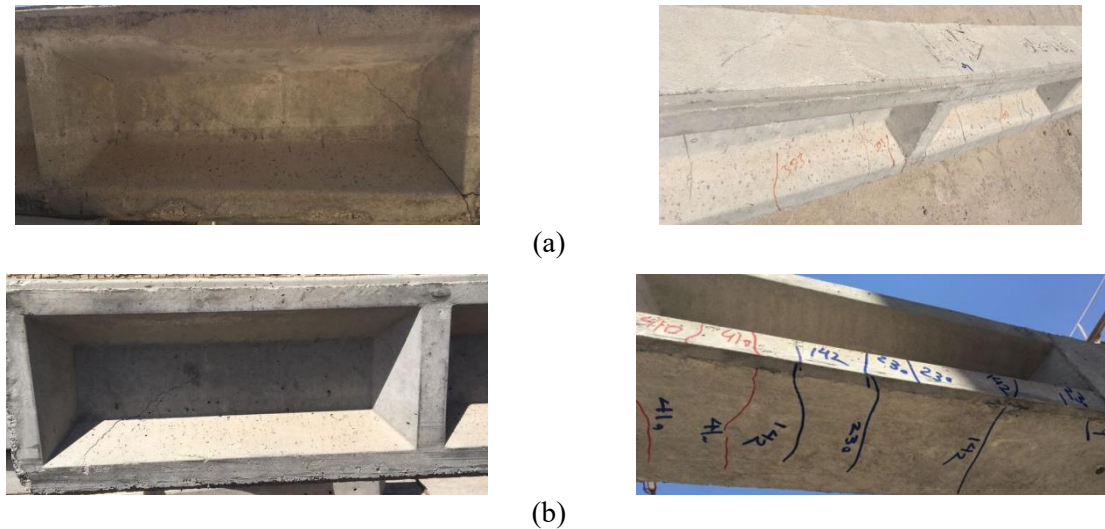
Cracking in: a) 9-400-60-1, and b) 9-400-60-2.
